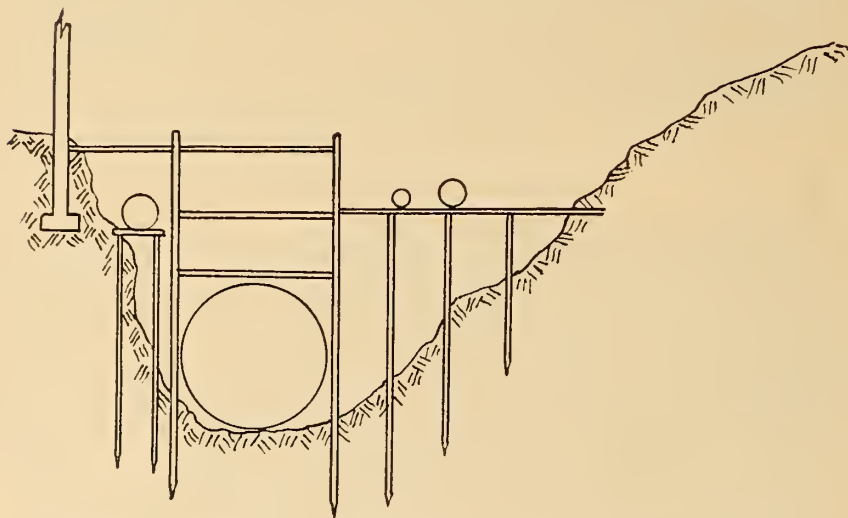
Cross section of bracing and timbering for reconstruction after bomb damage.
